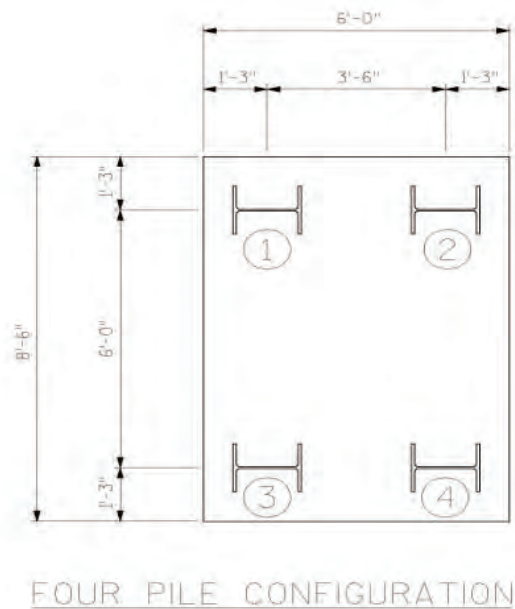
Typical pile group plan for WisDOT sign foundation. Primary direction of loading is along the longitudinal axis of the pile cap (i.e. “upward” in the figure).
